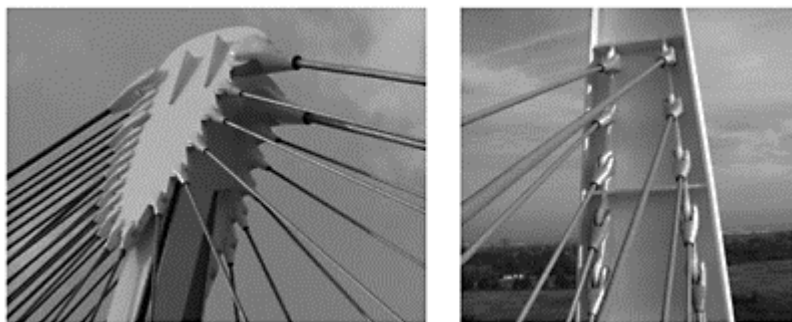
Tower connection details of Pedestrian Bridge Strasbourg/Kehl (France/Germany, 2003) and Sale Water Park Pedestrian Bridge in Manchester (UK, 2003).
